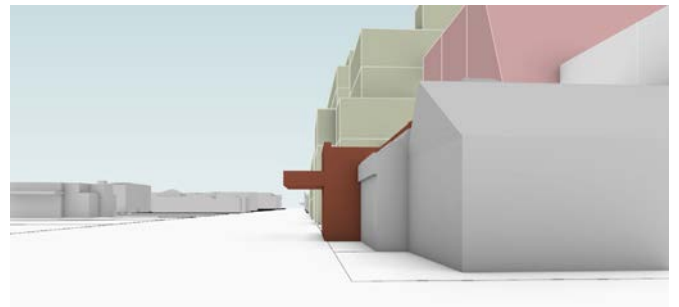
VIEW 4 - Looking west from the northern footpath on Swan Street at the intersection of Queen Street and Swan Street.
